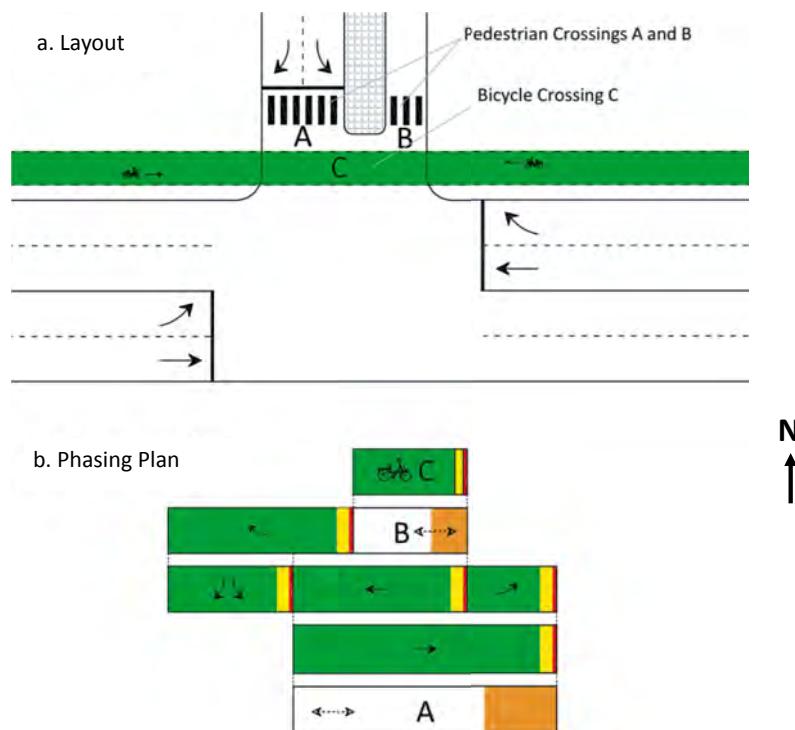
Intersection with a single-pass crossing for bicycles while pedestrians have a two-stage crossing: (a) layout and (b) phasing plan.
